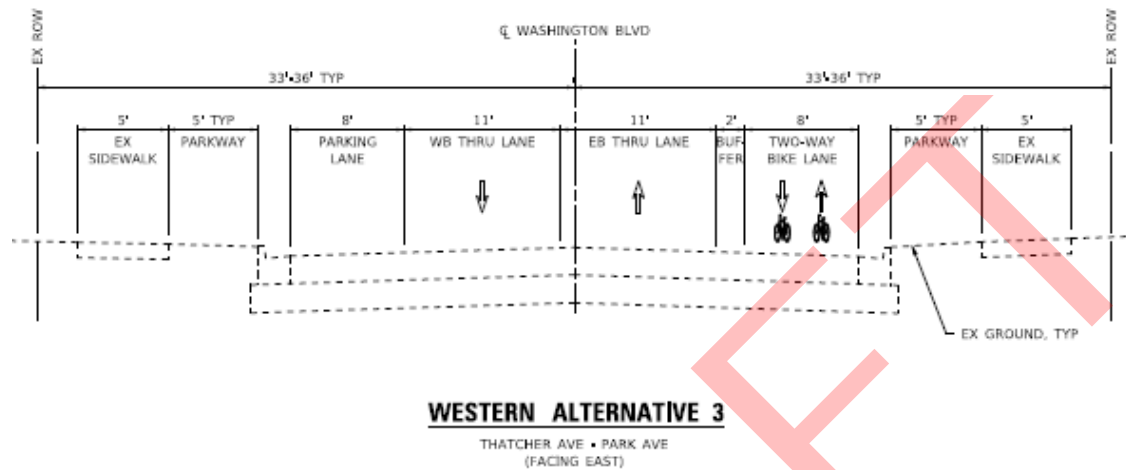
Western Typical Section Alternative 3 Washington Blvd.
